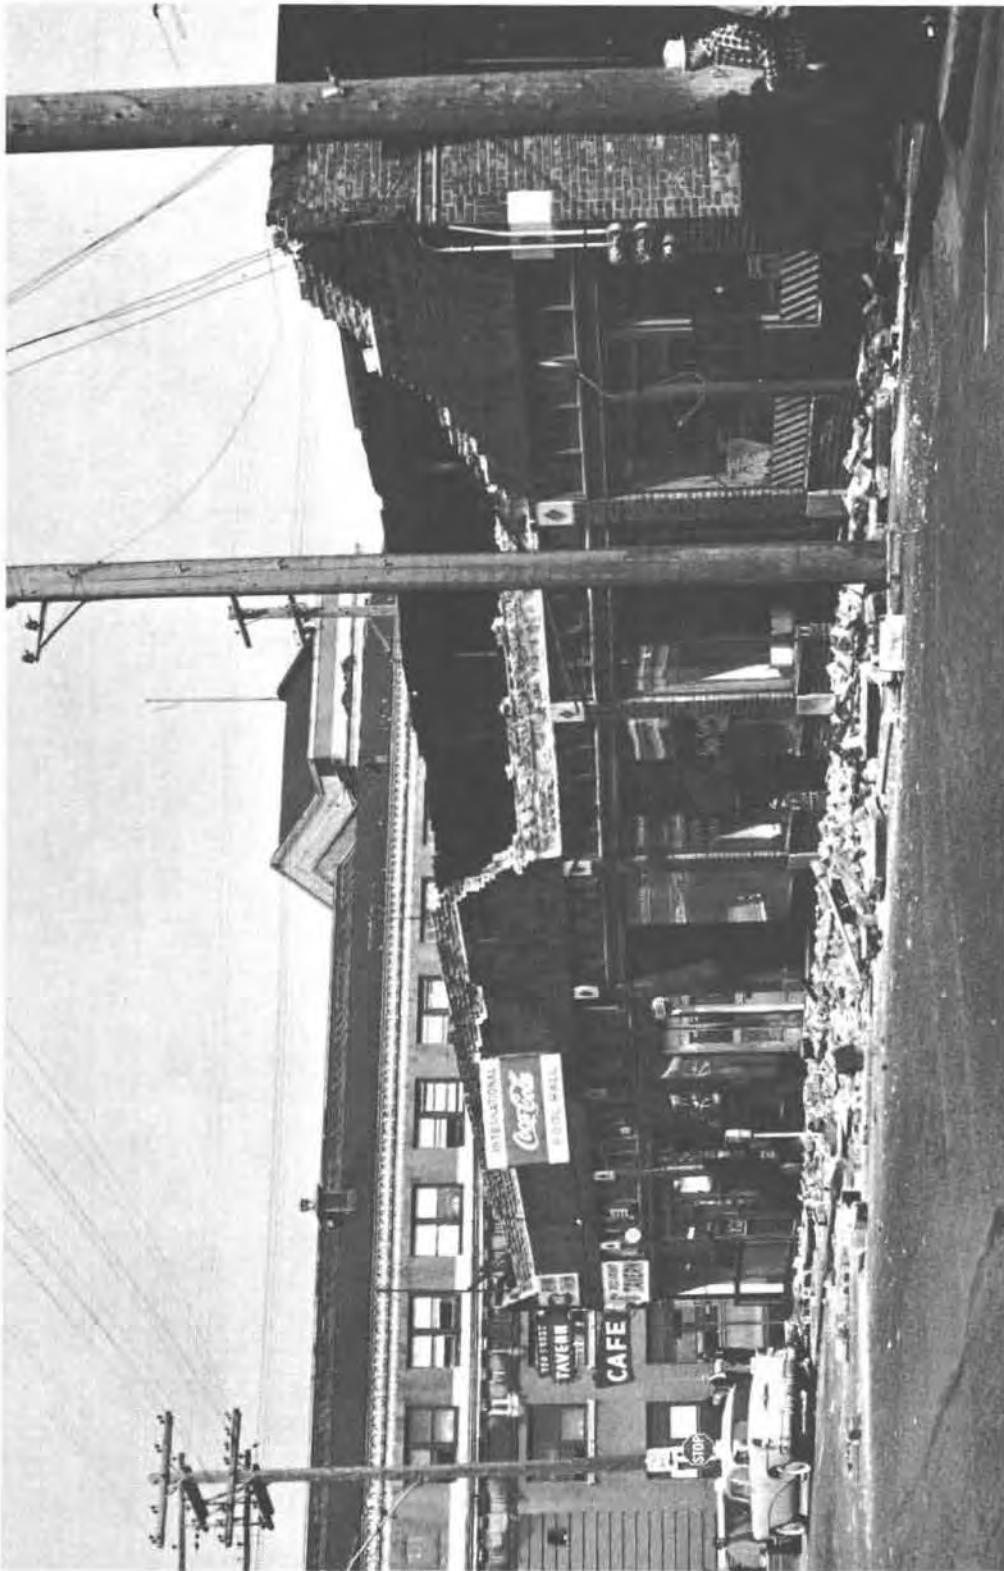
Failure of unreinforced brick parapet wall in Seattle. (Photo by Seattle Fire Department.)
